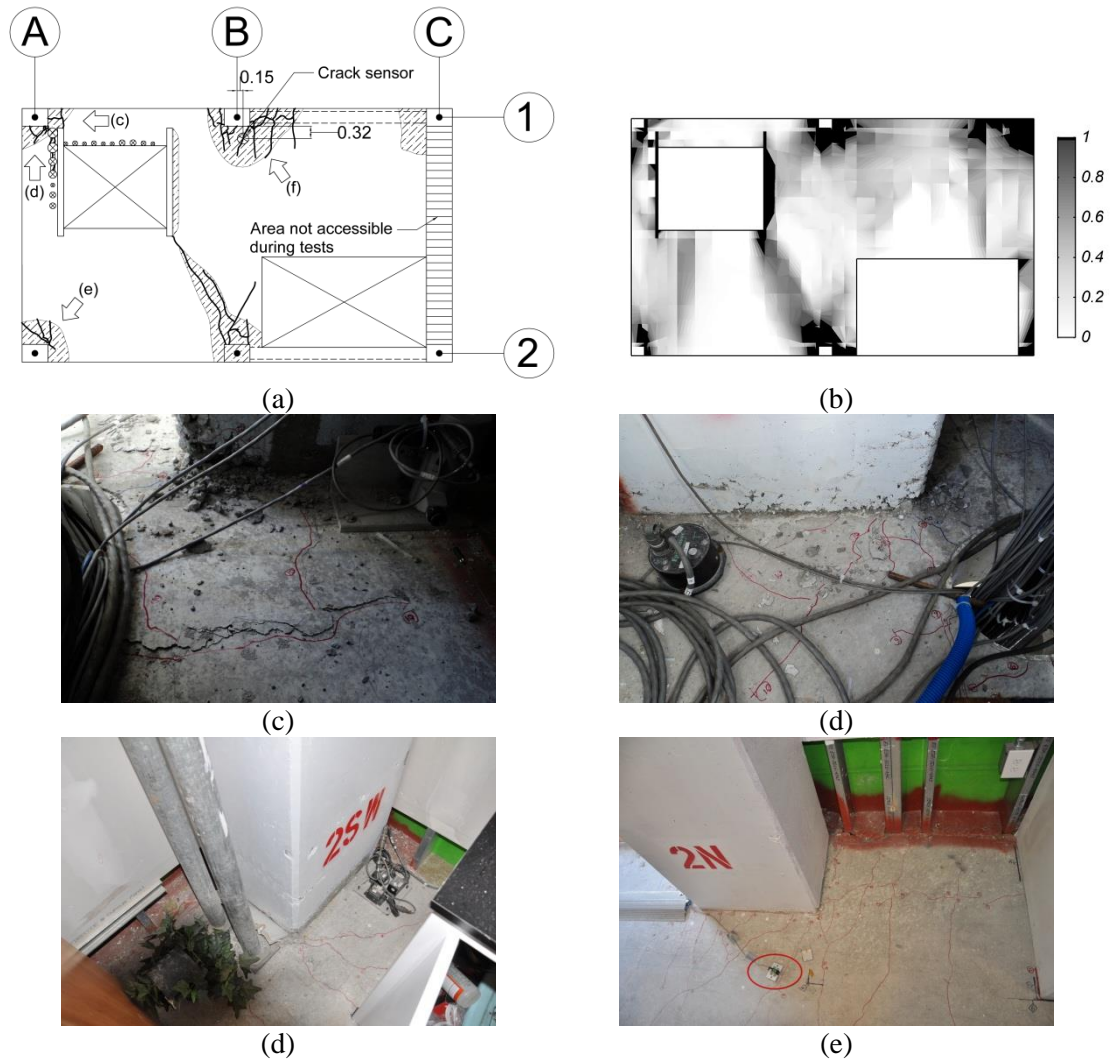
Comparison of FE predicted and observed cracks on the top surface of the second floor slab after FB-5: *DEN67*: (a) experimental observation; (b) maximum crack opening based on FE prediction (units are in mm); damaged state of the second floor slab after FB-5: *DEN67* at (c) north-west corner (observed from east side), (d) north-west corner (observed from south side), (e) south-west corner, and (f) around north-middle column.
